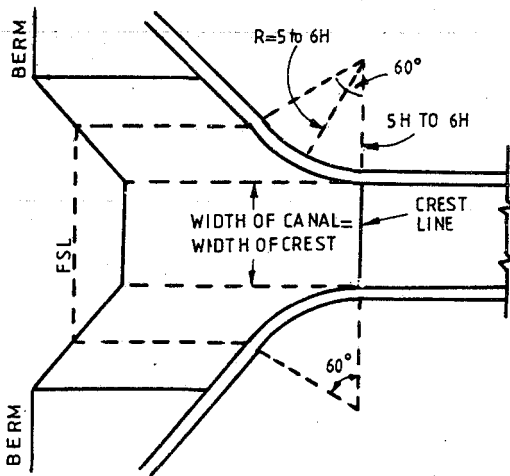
Upstream wing walls for Trapezoidal crest of Sarda Type fall.
